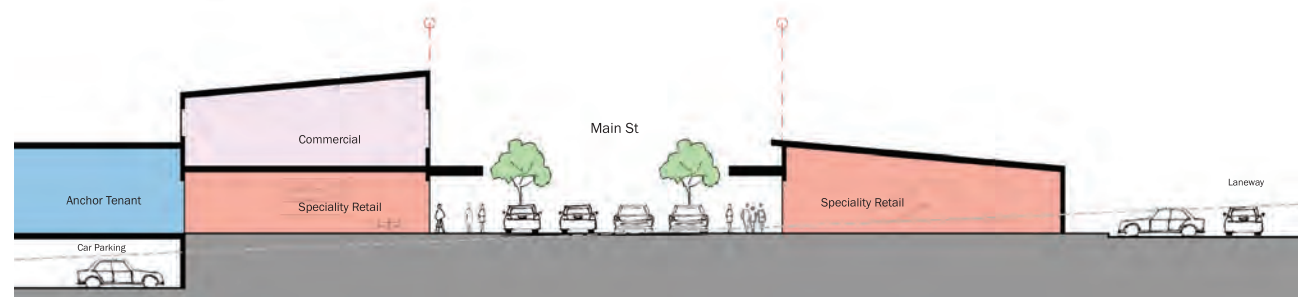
Cross Section of Preferred Built Form Siting in Precinct 1
